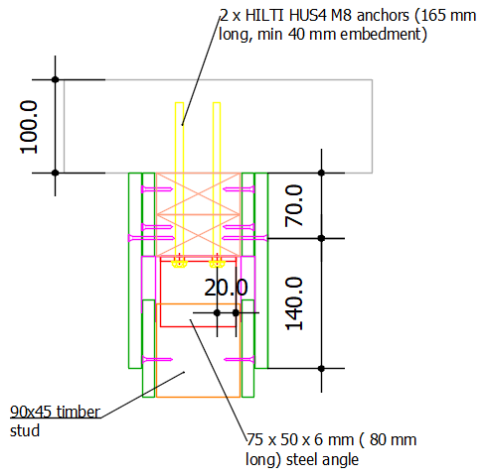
Wall section elevation for in-plane and north out-of-plane wall (dimensions in mm)
